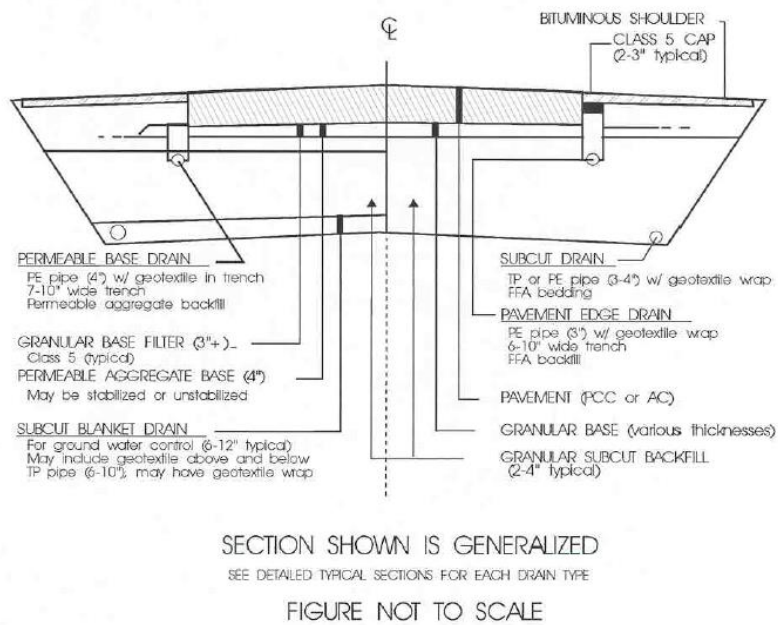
Typical subsurface drainage section (Minnesota DOT 2007).
